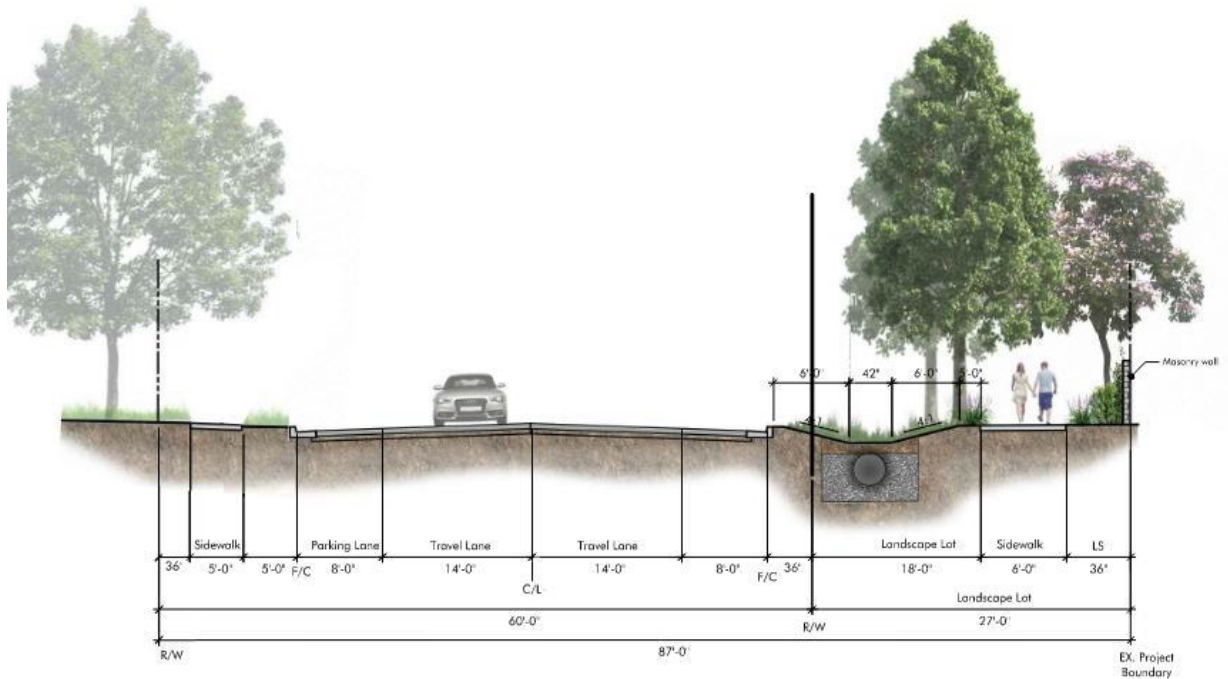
60' ROW Street with Landscape Buffer – Front yard landscape on one side
